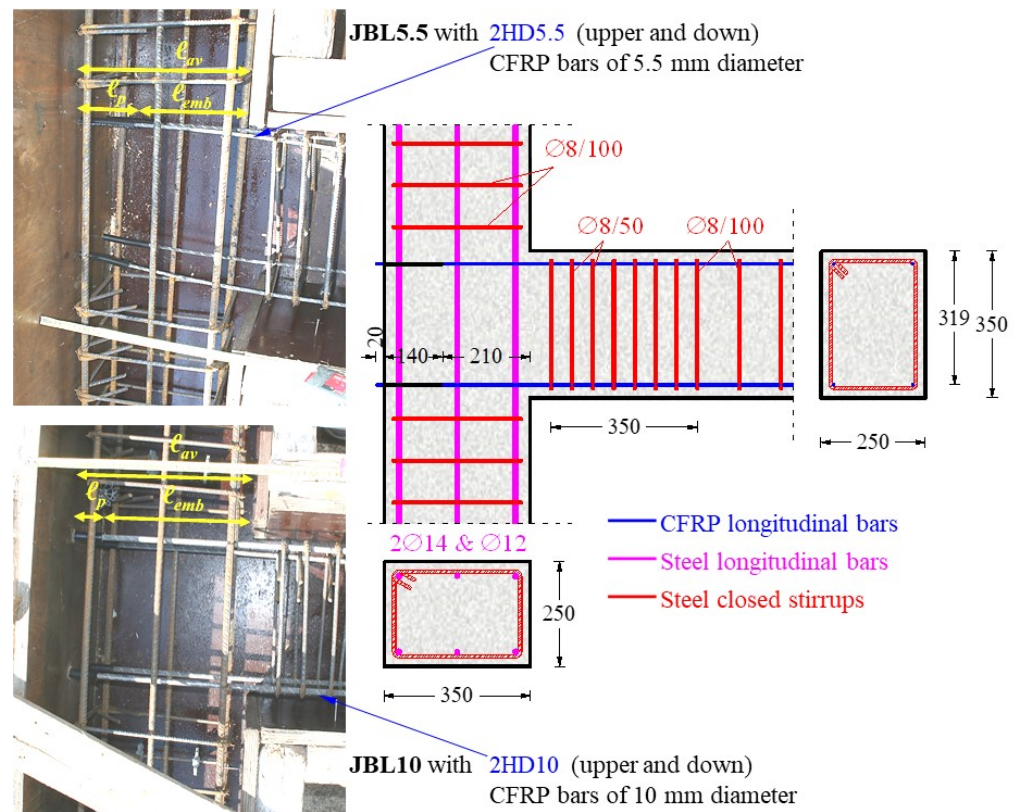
Geometry and reinforcement details of the joint region in specimens JBL5.5 and JBL10 (dimensions in mm).
